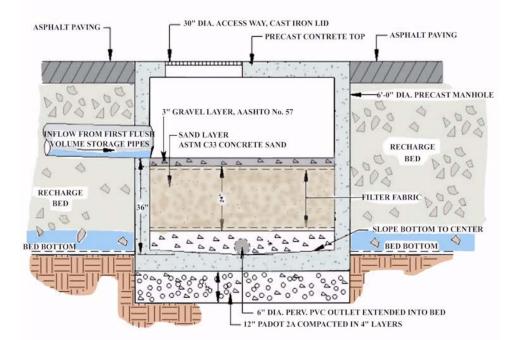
Shows the construction design detail for the filter station at the Truck Plaza.
